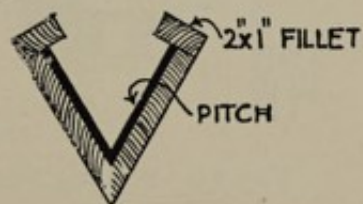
V-Shaped Wood Drains as Used in Benches.
